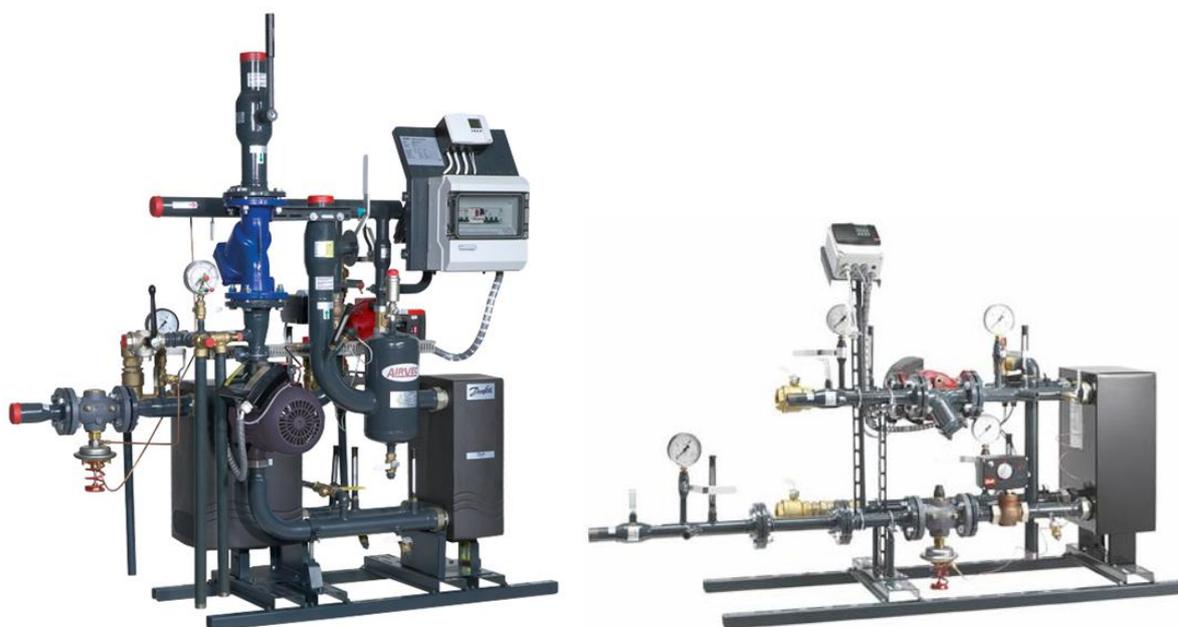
Examples of floor mounted substations with heat exchanger for blocks or large commercial, retail or office connections. The components are illustrated without insulation /casing (Photo: Danfoss)
